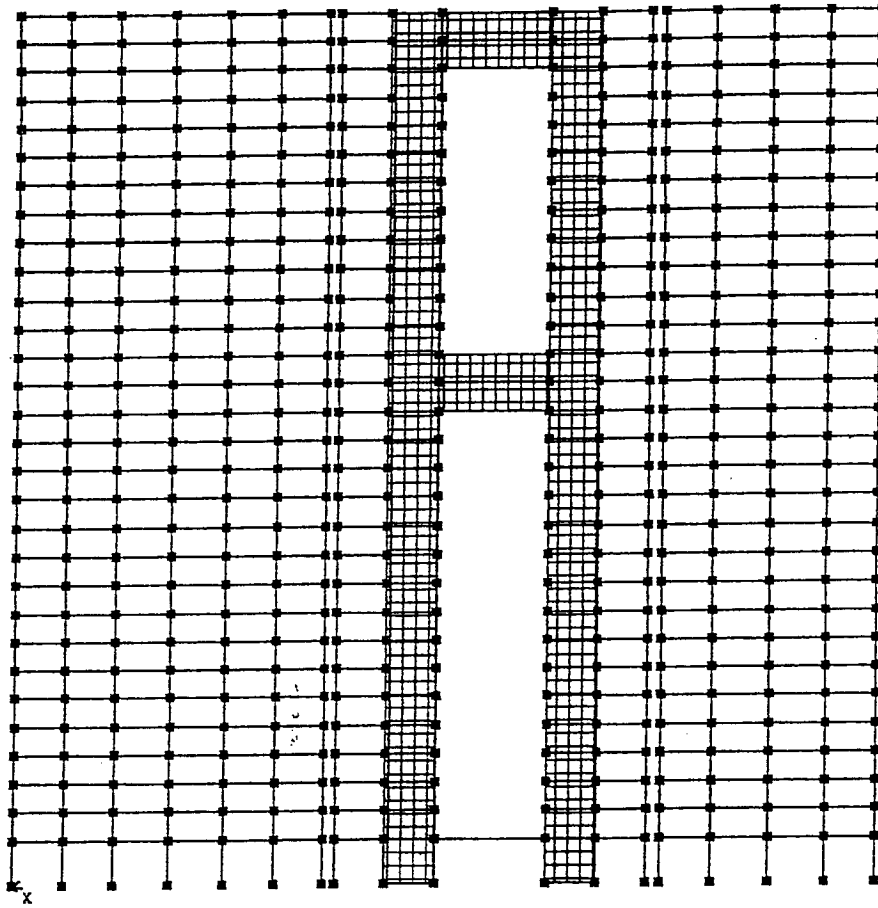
Retrofitted S-K Redesigned Building, Mid-height and Top Coupled Shear Walls
